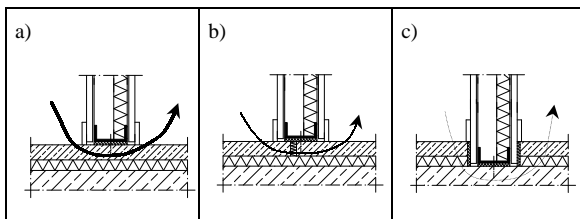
Different ways of building of the lightweight walls on the floor slabs with floating floors
